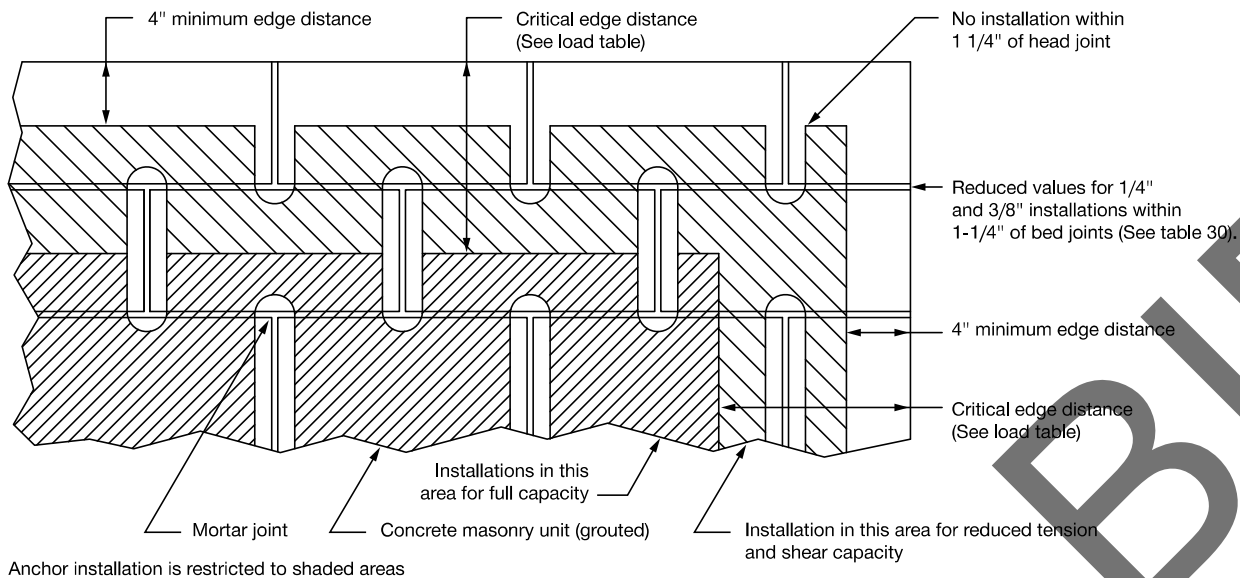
Acceptable locations (shaded areas) for Hilti KH-EZ, KH-EZ P, KH-EZ PM, KH-EZ PL, KH-EZ C and KH-EZ CRC anchors in grout-filled concrete masonry
